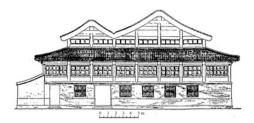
East elevation of Huguang Guild Hall Theatre. Source Wang (2004: 378)
